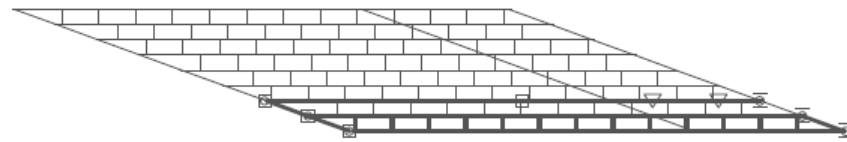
shows a representative erection scheme for the straight skewed Bridge (J1) NISS54 at its Stage 3. The stage designation follows the scheme discussed in Section 3.6.2. Due to the bridge's 300 ft. span, a shoring tower is needed to facilitate the splice connection from Stage 3-1 to Stage 3-4. The shoring tower support is only on the girder that is being installed, and is shown by the square symbol within the span in the plan view. Only the end cross-frames and a few top and bottom flange struts are installed between the girders during these stages. After Stage 3-3, the shoring tower is removed and the remaining cross-frames are installed sequentially.
